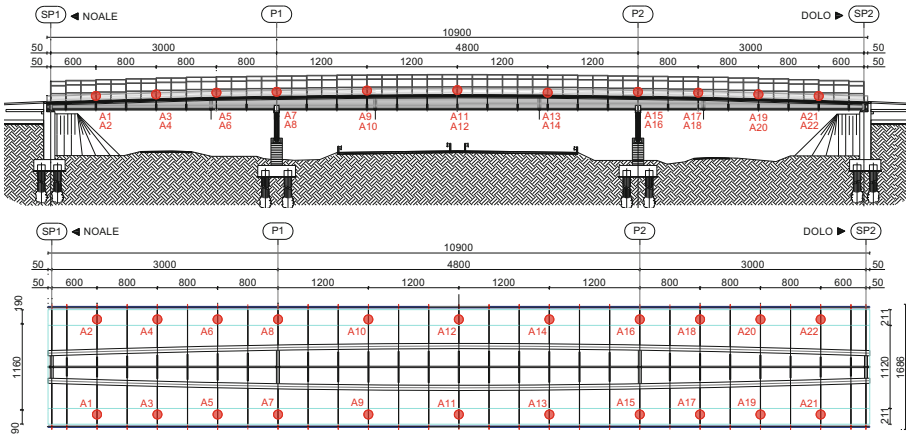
Elevation and plan of the *Dolo* overpass (dimensions in cm) and schematic of the sensor layout during the preliminary AVT and the continuous monitoring.
